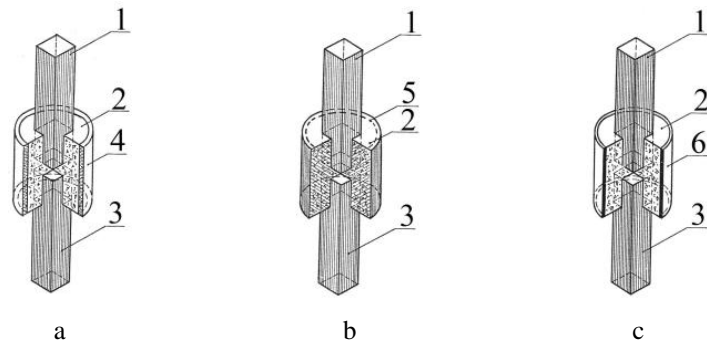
Pile – column construction: a- with reinforced concrete ring; b – with removable steel ring; c – with steel ring. 1 – column; 2 – concrete; 3 – pile; 4 – reinforced concrete ring; 5 – reinforcement structure; 6 – steel ring
